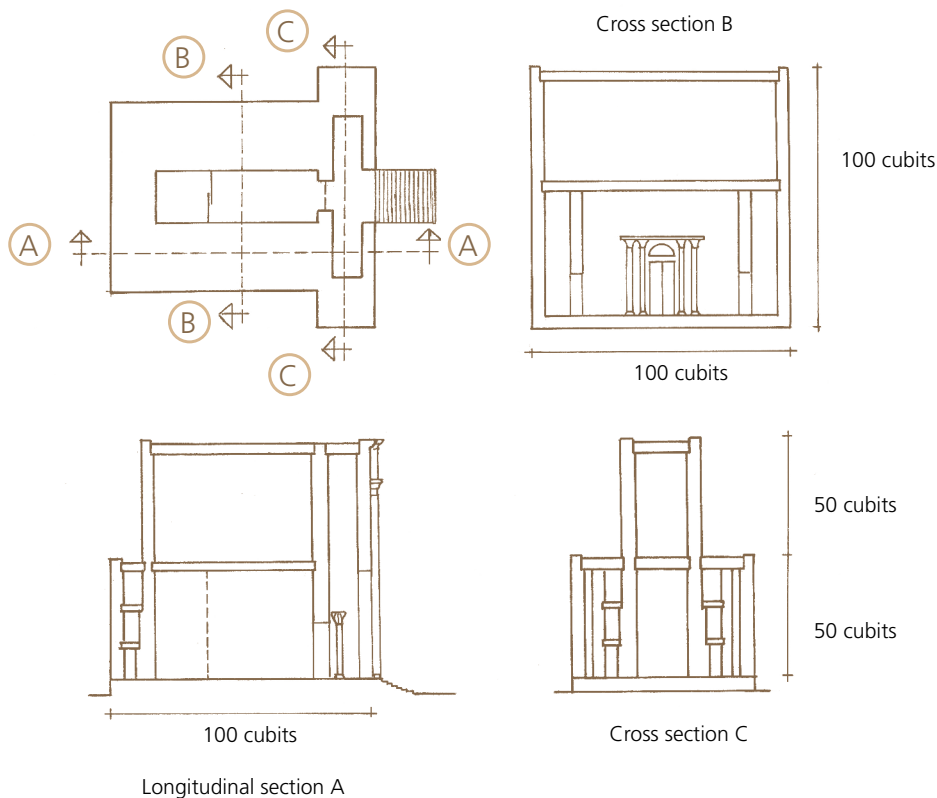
Floor plan, longitudinal and cross sections Herod's temple. (Drawn by author). The dimensions are according to the Mishnah.
